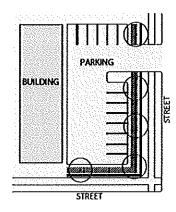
Landscaping Buffer with Evergreen Plantings-Plan View
